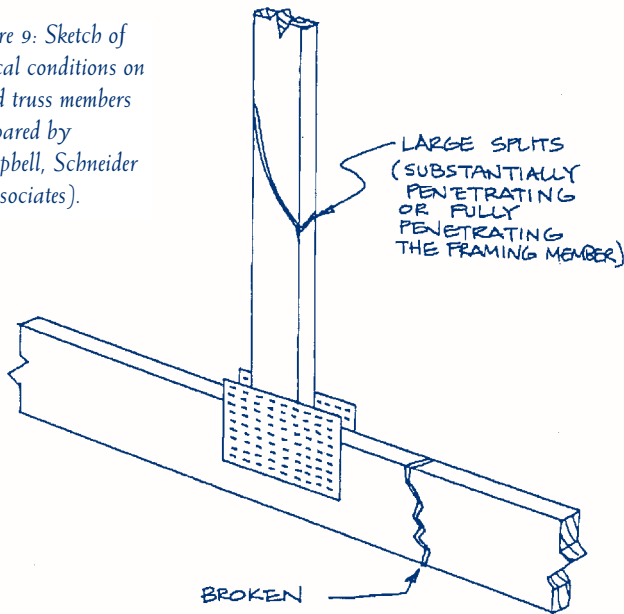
Sketch of typical conditions on failed truss members (prepared by Campbell, Schneider & Associates).
